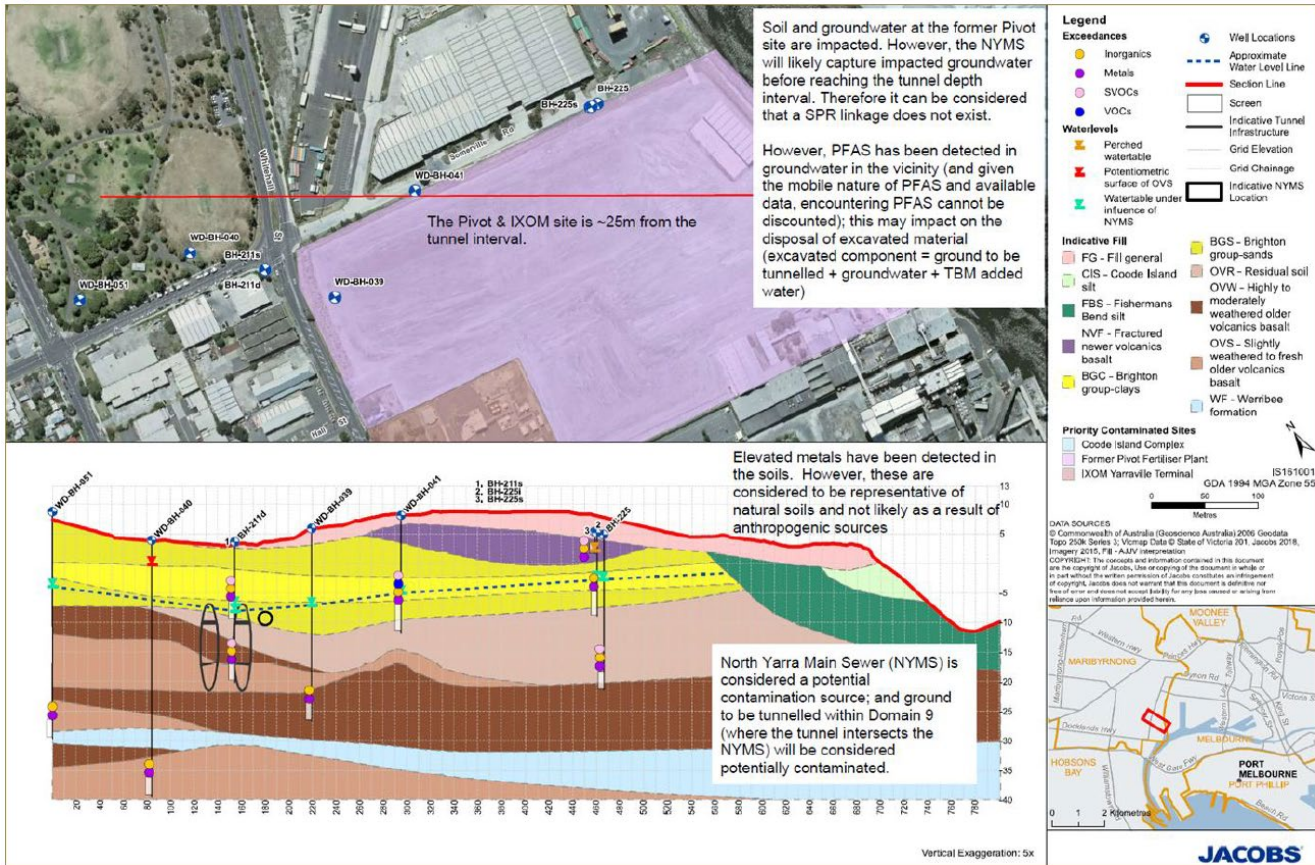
Conceptual site model cross section 6 – former Pivot plant
